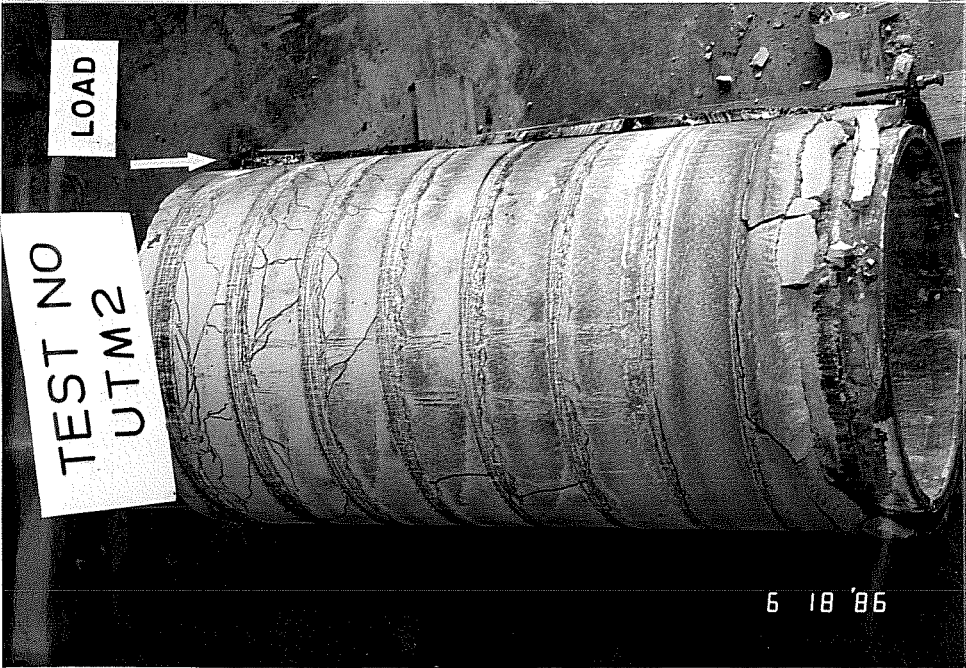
Grout surface on sleeve side for Specimen UTM2
